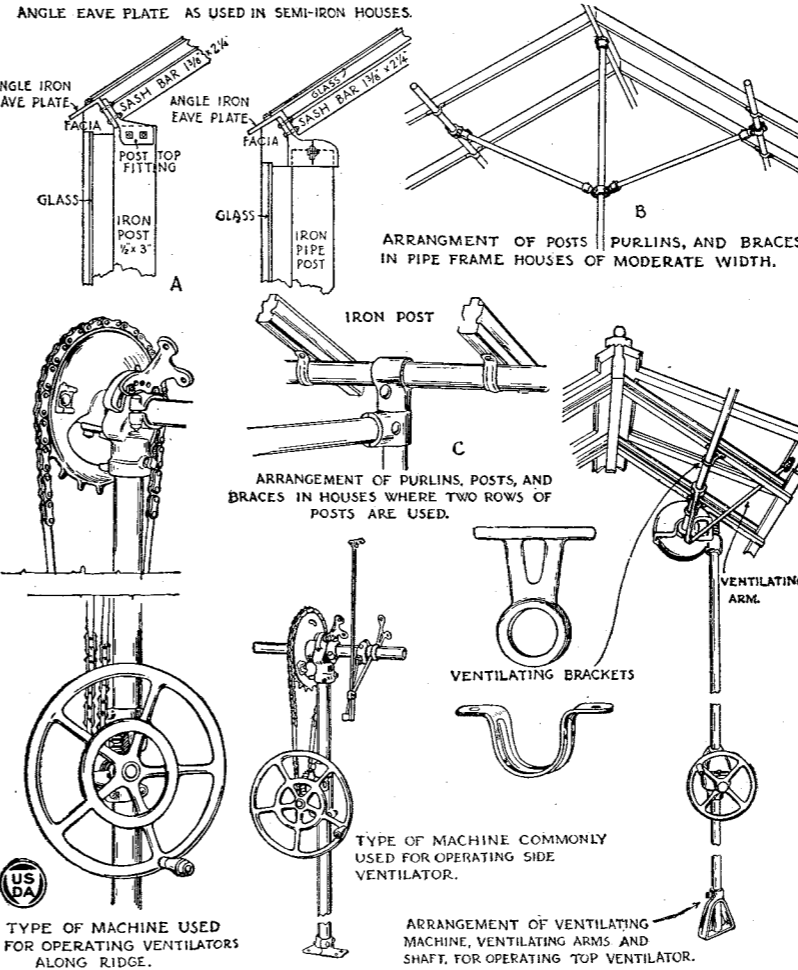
Details of construction of special features for a wooden or a semi-iron greenhouse: A, Iron and iron-pipe posts with special top fittings; B, arrangement of inside posts and braces where one row of inside posts is used; C, when two rows of posts are used they are usually placed under the purlins and tied together, as shown.
